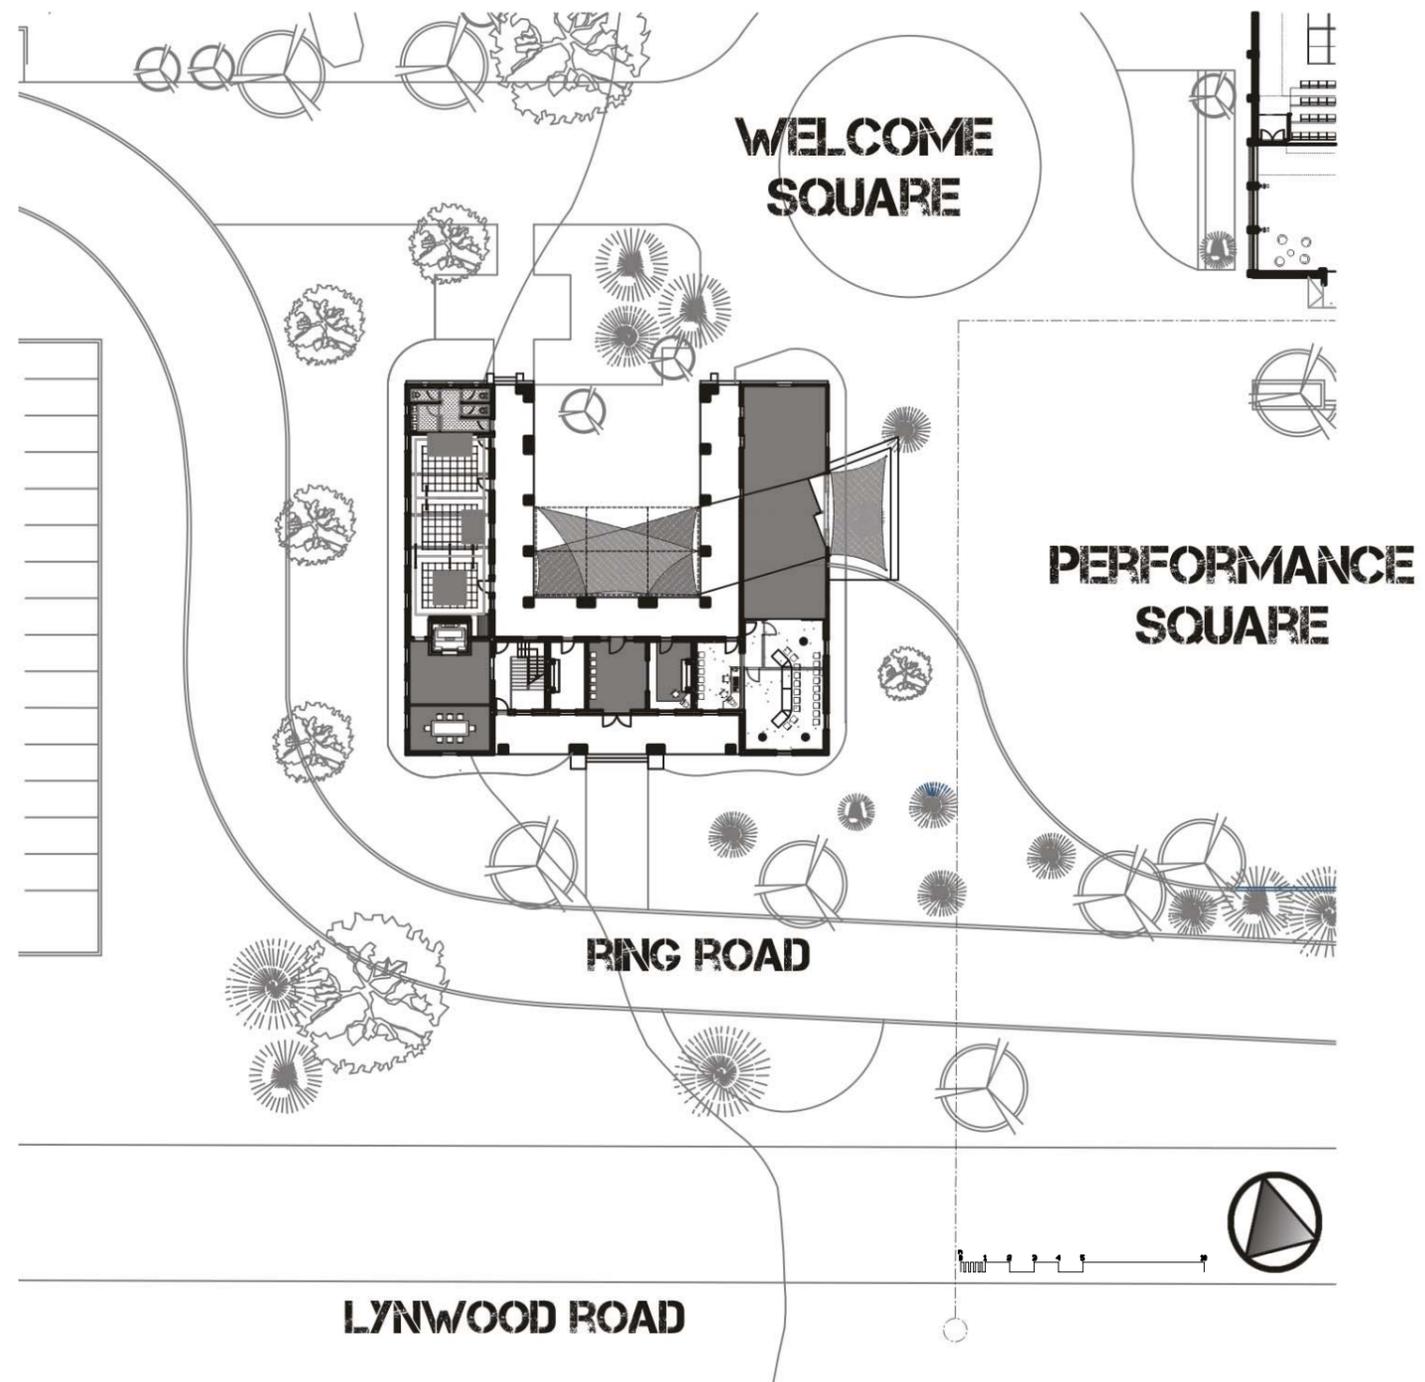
Site plan for the proposed design of the Drama Building. Chita M
